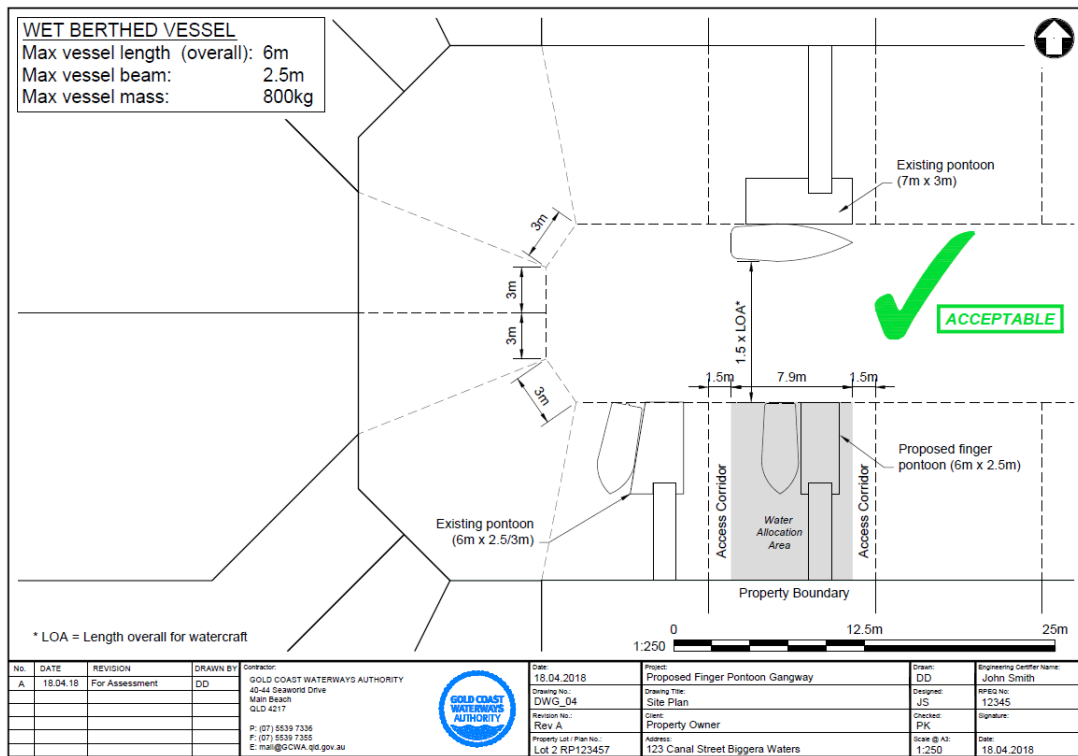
Example of acceptable site and layout plan and water allocation area plan
